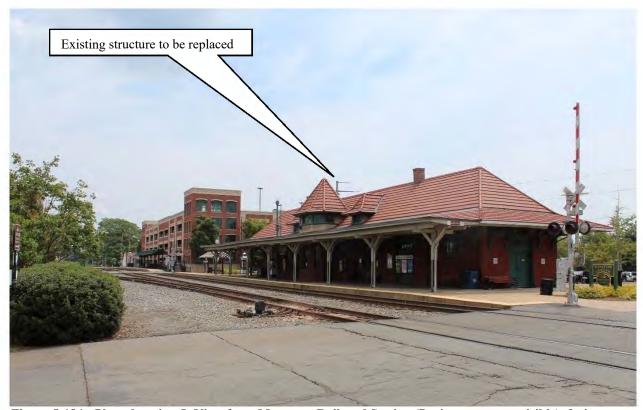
Photo location 5- View from Manassas Railroad Station (Project structure visible), facing southeast.
